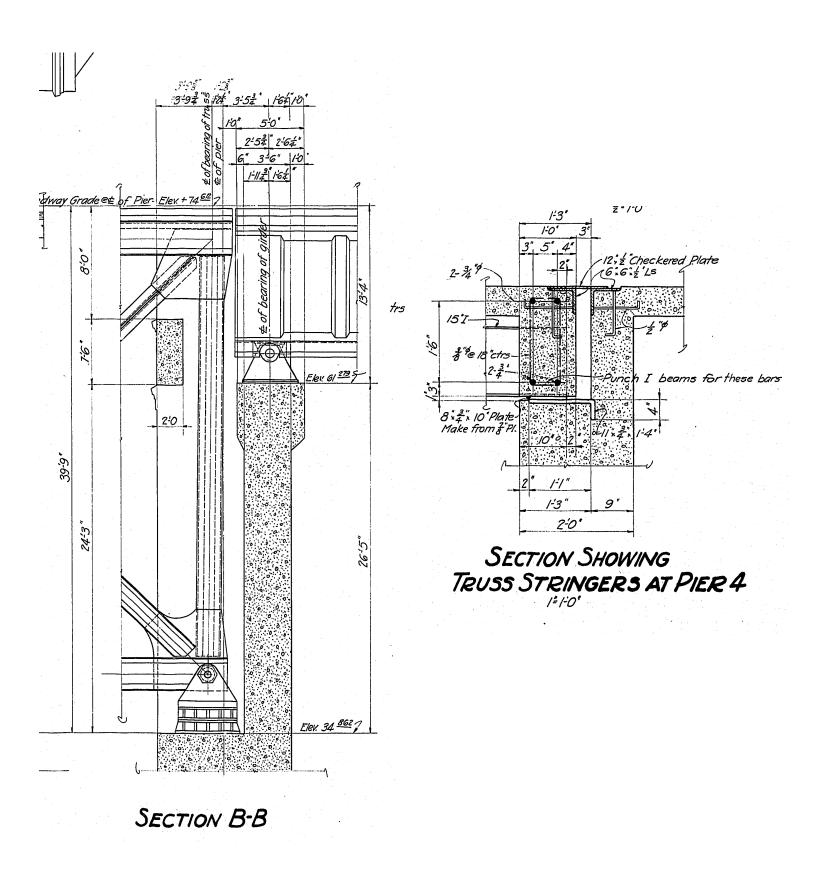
Burnside Bridge Fixed Spans to Approach Joint in the Deck System
